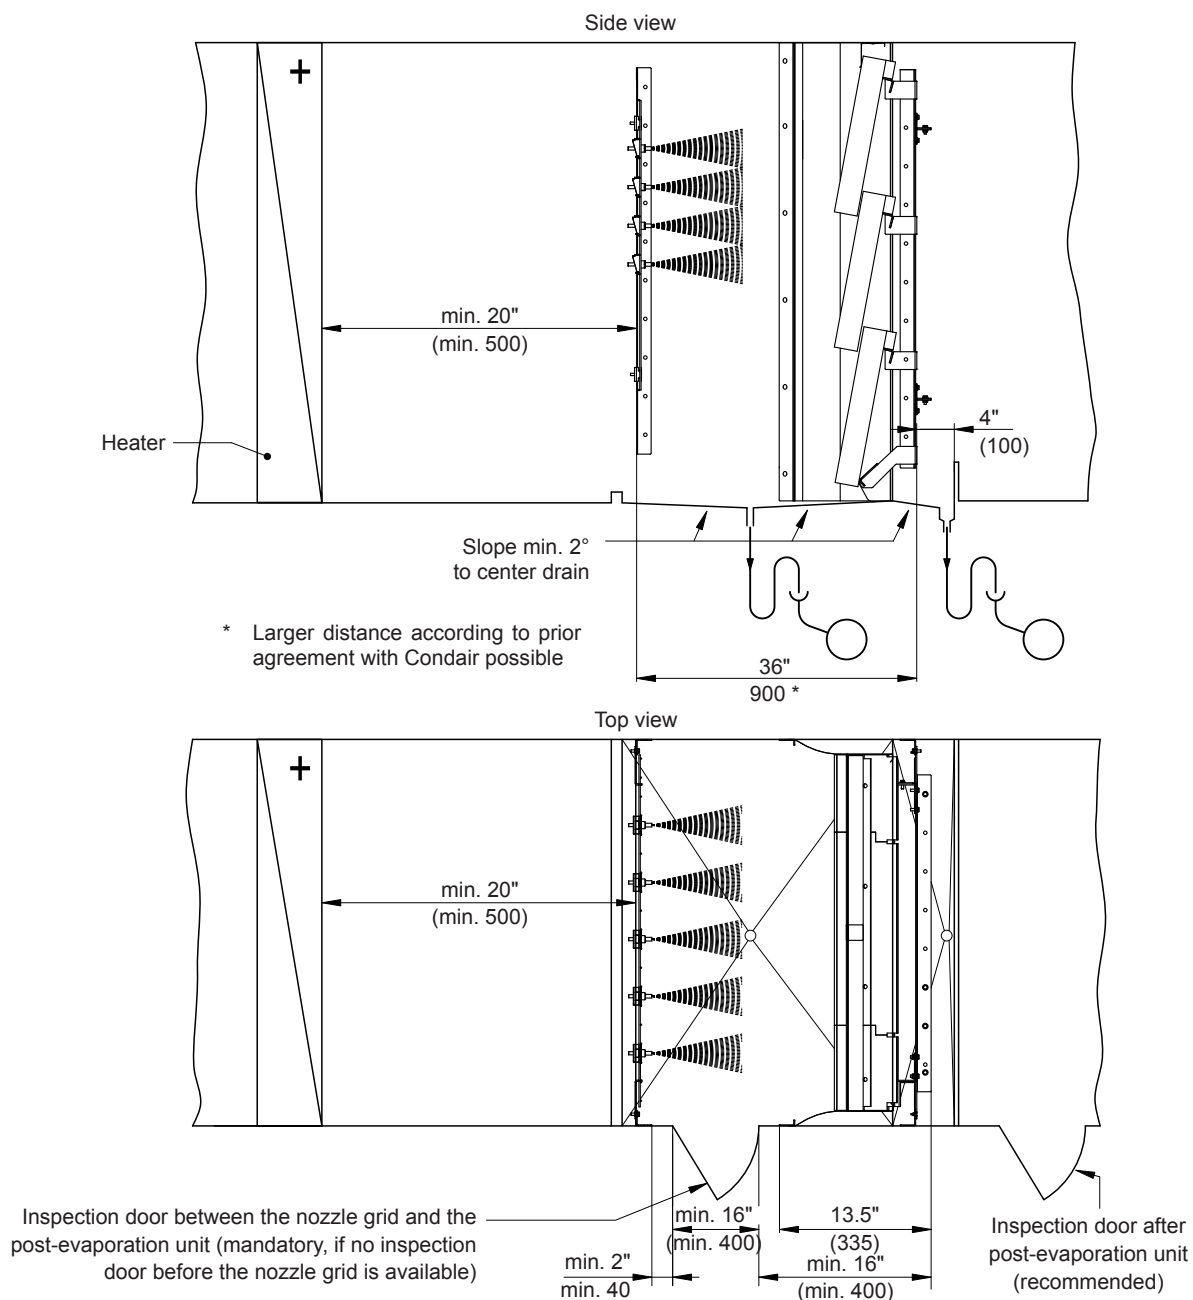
Positioning of the humidification unit with inspection door between nozzle grid and post-evaporation unit and after post-evaporation unit - dimensions in inches (mm)
